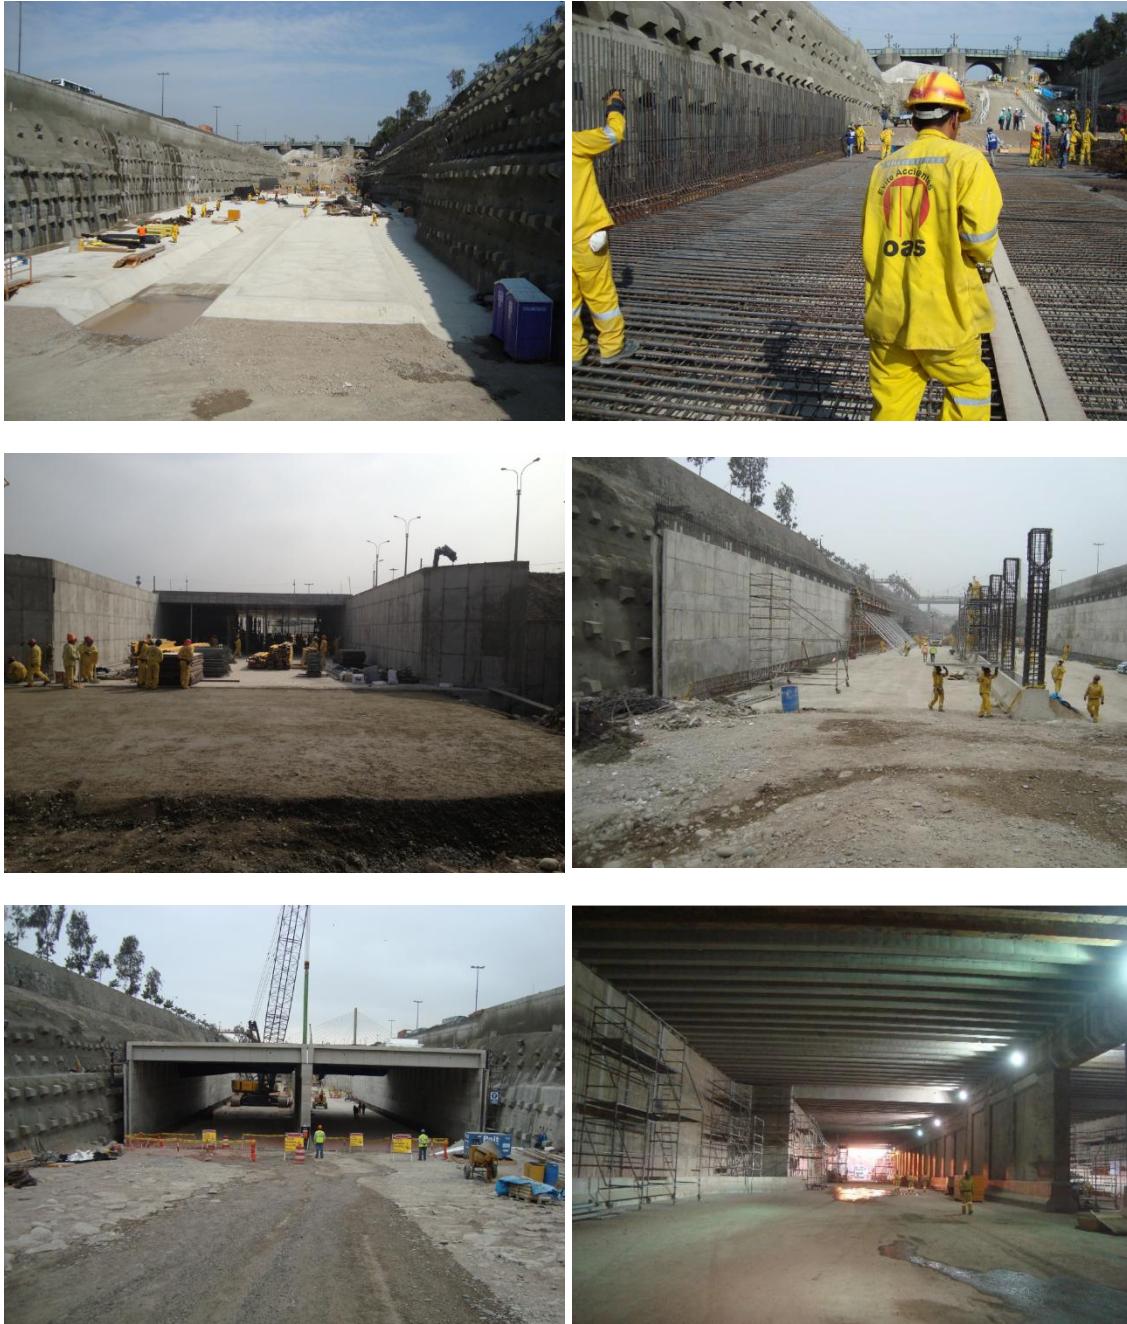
Construction stages of the tunnel, illustrating the final excavation, execution of the bottom slab, lateral walls, and roof beams.
